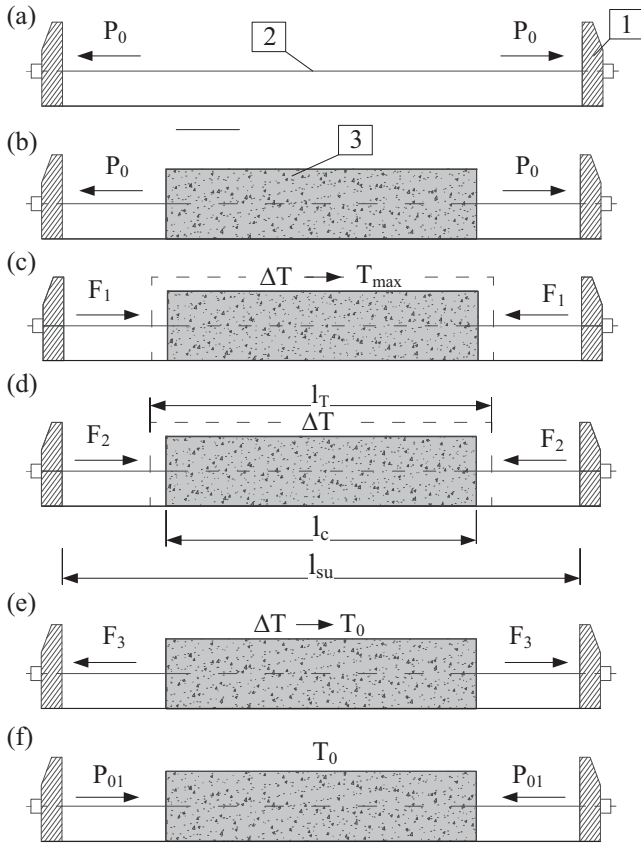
Stages of prestress force variation during production: a – prestressing reinforcement (2) to the abutments (1); b – concreting (3) after maintenance; c – the beginning of heat treatment before bond between reinforcement and concrete appears; d – heat treatment ($\Delta T = T_{max} - T_0$); e – cooling stage (until T_0 or ambient); f – release of reinforcement.
